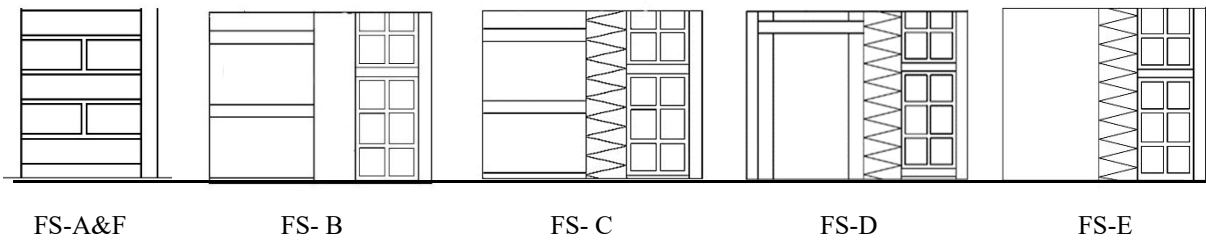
(a) Layers of the opaque part from outside to inside; (facade system A) 30cm solid brick wall, 1.5cm gypsum plaster; (b) 11.5cm perforated facing brick, 4cm air cavity without insulation, 7cm hollow clay brick, 1.5cm gypsum plaster; (c) 11.5cm perforated facing brick, 6cm expanded polystyrene (EPS), 7cm hollow clay brick, 1.5cm gypsum plaster; (d) 1.5cm cement plaster, 12cm AAC block, 6cm polyurethane (PUR), 7cm hollow clay brick, 1.5cm gypsum plaster; (e) 12cm prefabricated concrete panel, 6cm extruded polystyrene (XPS), 7cm hollow clay brick, 1.5cm gypsum plaster; (f) the same as facade system A.
